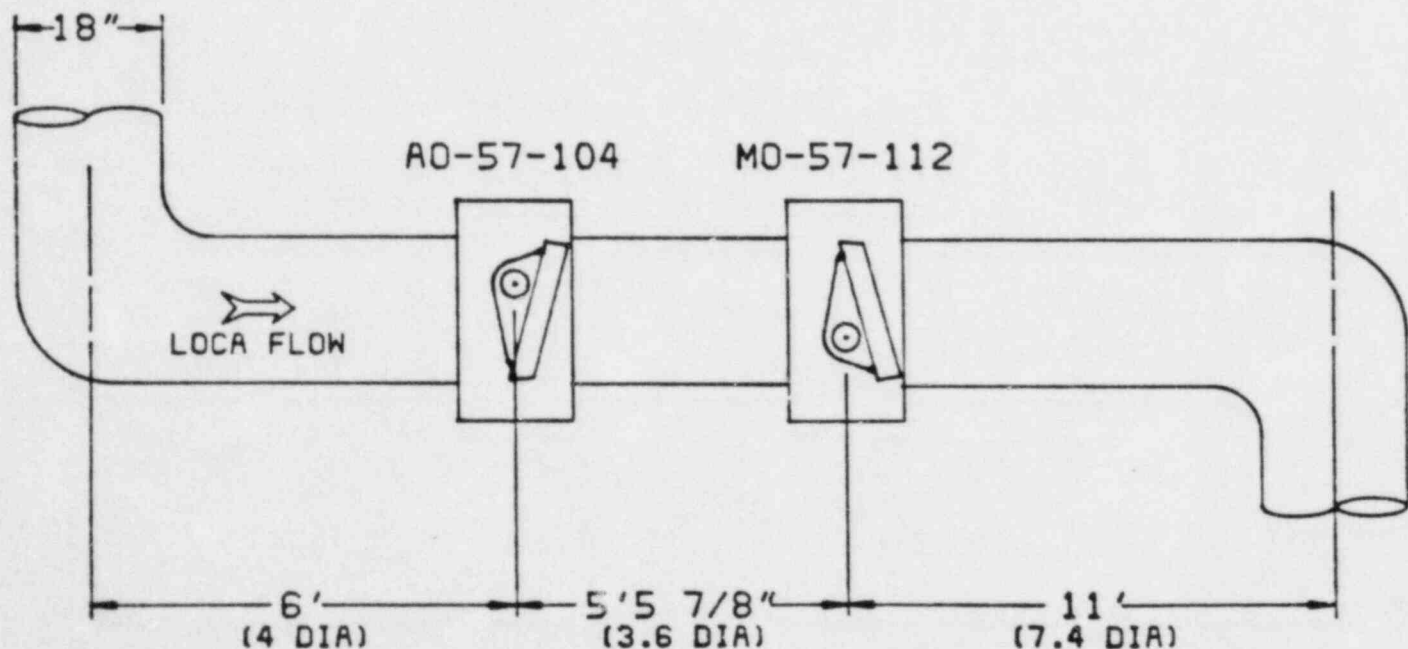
VALVES AO-57-104 & MO-57-112 AS INSTALLED
